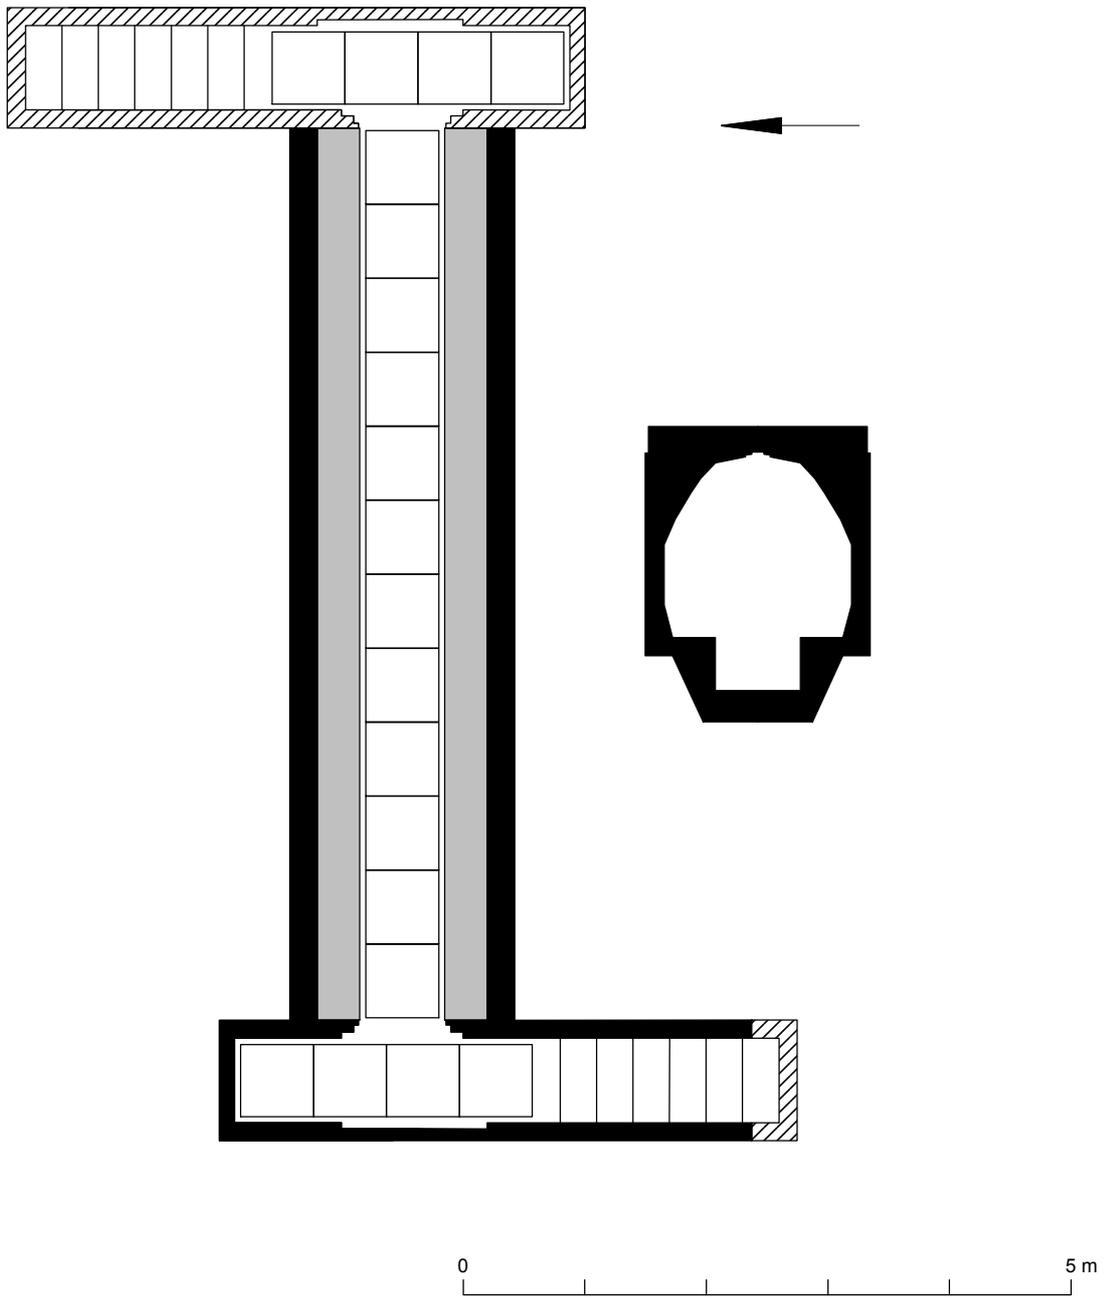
Development Area 7: air-raid shelter WBF85 - plan and cross-section.
